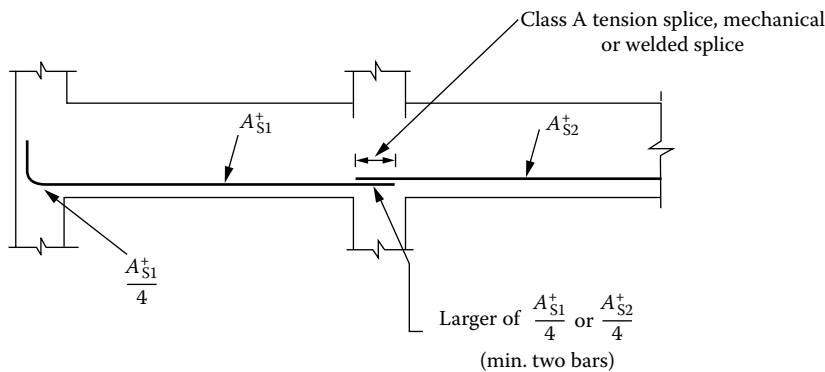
Integrity reinforcement in beams other than perimeter beams.
